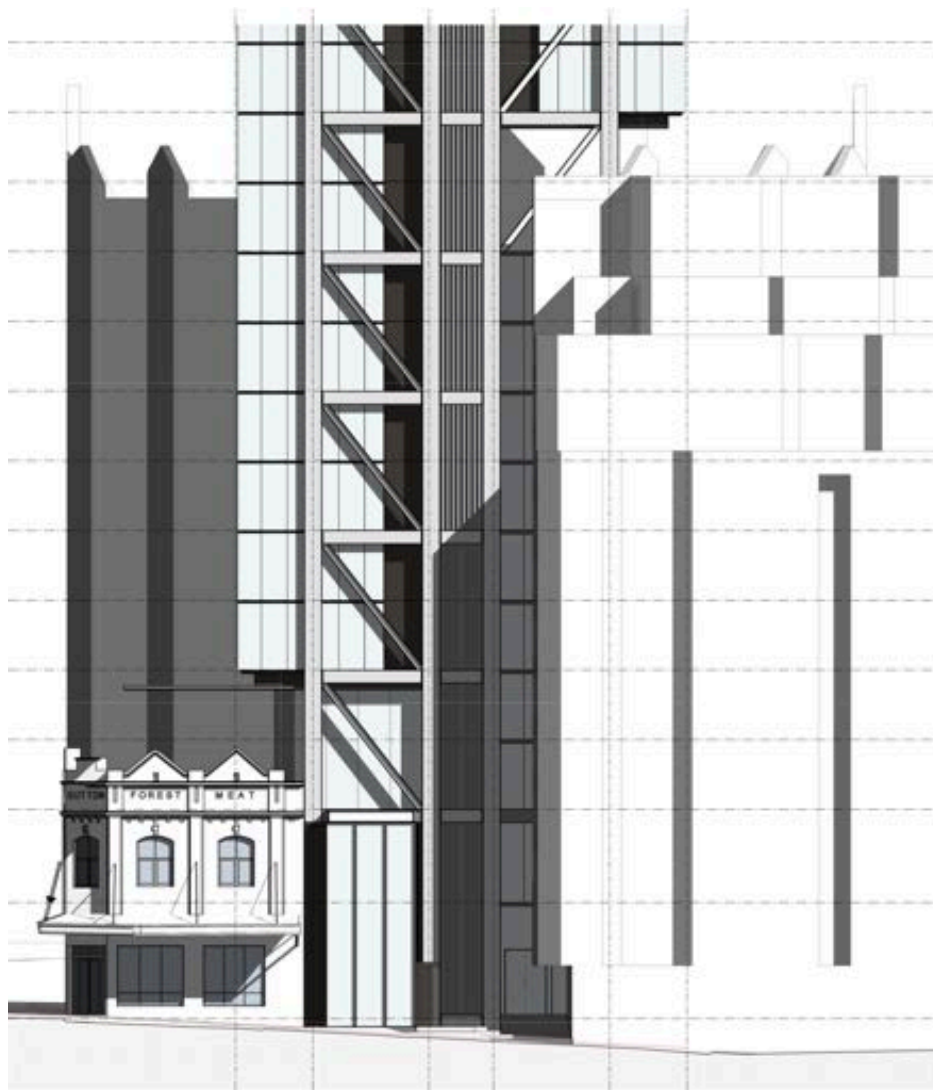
Detail elevations of the Planning Proposal in relation to the Former Sutton Meat Building. Grimshaw Architectural.
